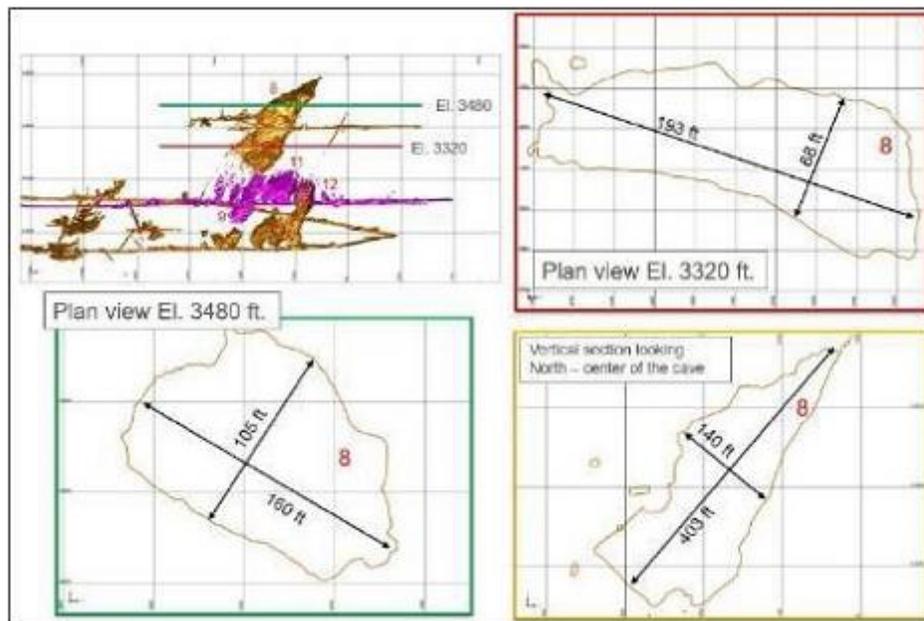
Detail on 5-level McGatlin Stope (With Sections) Used for Span Analysis
